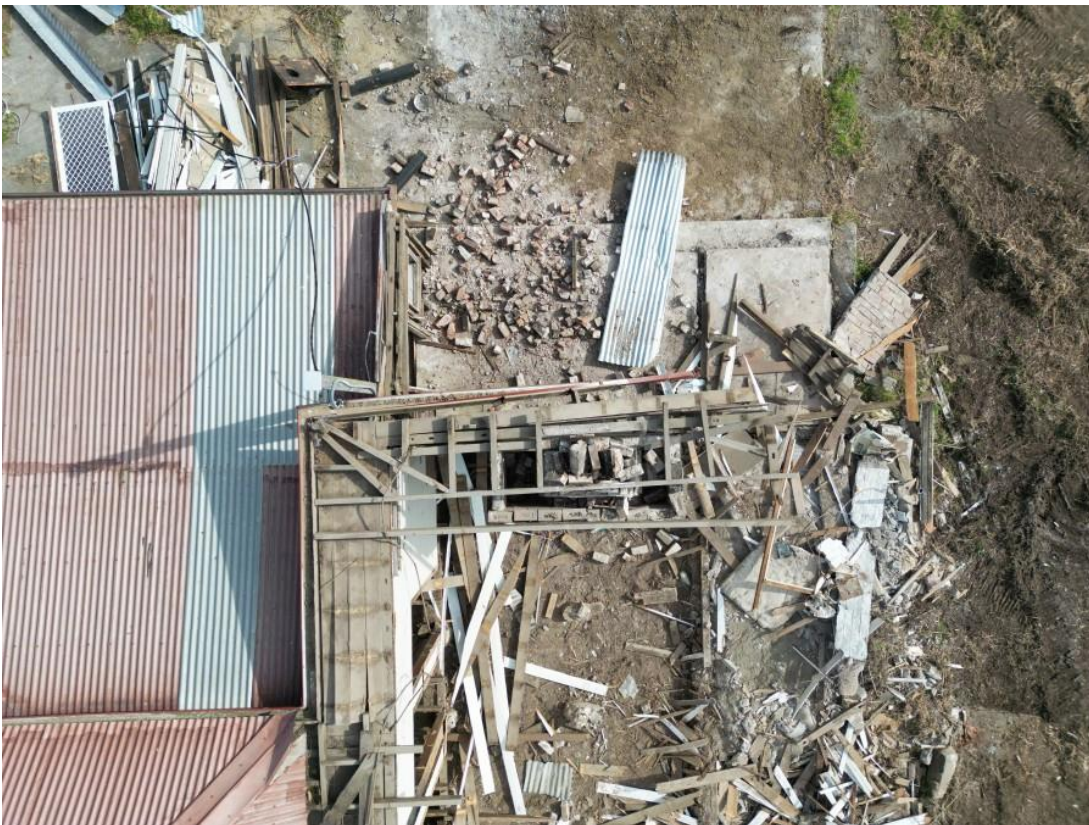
The house site during demolition before the excavation area was cleared (Source: CRM)
